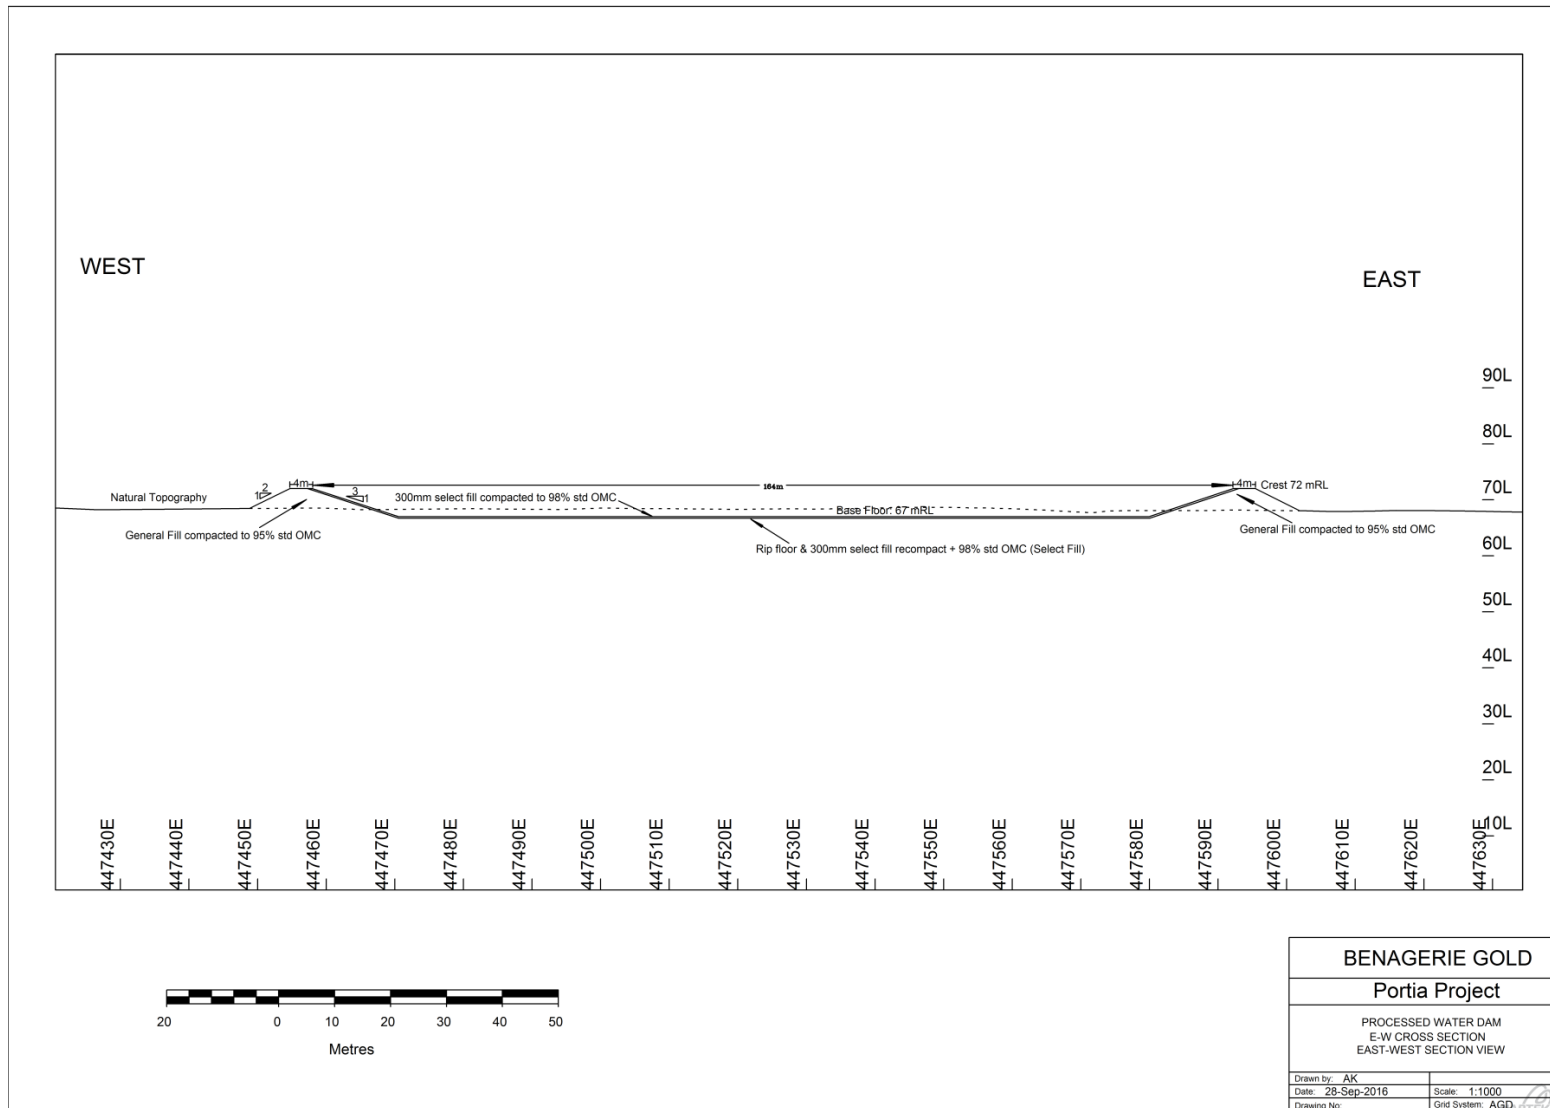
Cross-Section Looking North of Balance Pond 1 (previously Process Water Dam (Design))
